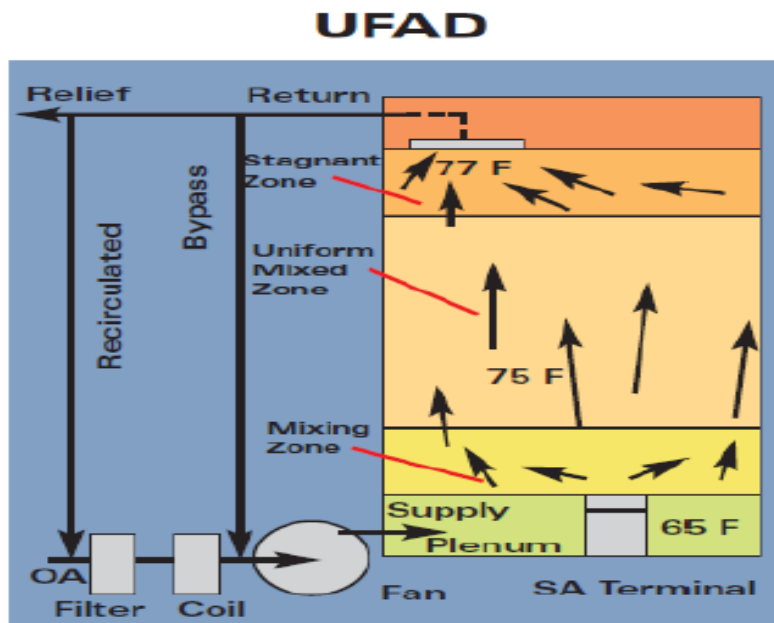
Underfloor air distribution system [Source: Testing Adjusting and Balancing Bureau talk for ASHRAE by James E. Woods]
